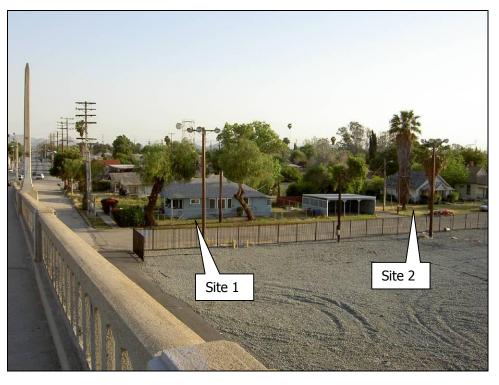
Looking Southwest from Mount Vernon Avenue Bridge
